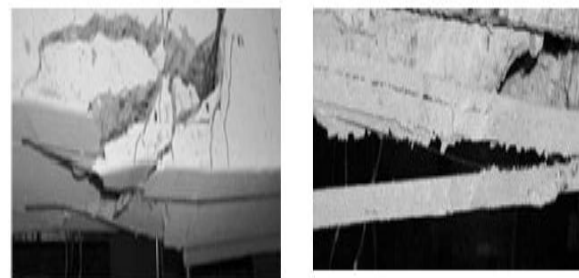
Failure due to cover separation (a) propagation of flexural-shear cracks; (b) fracture along the laminate (Courtesy Costa et al. 2010[143])
